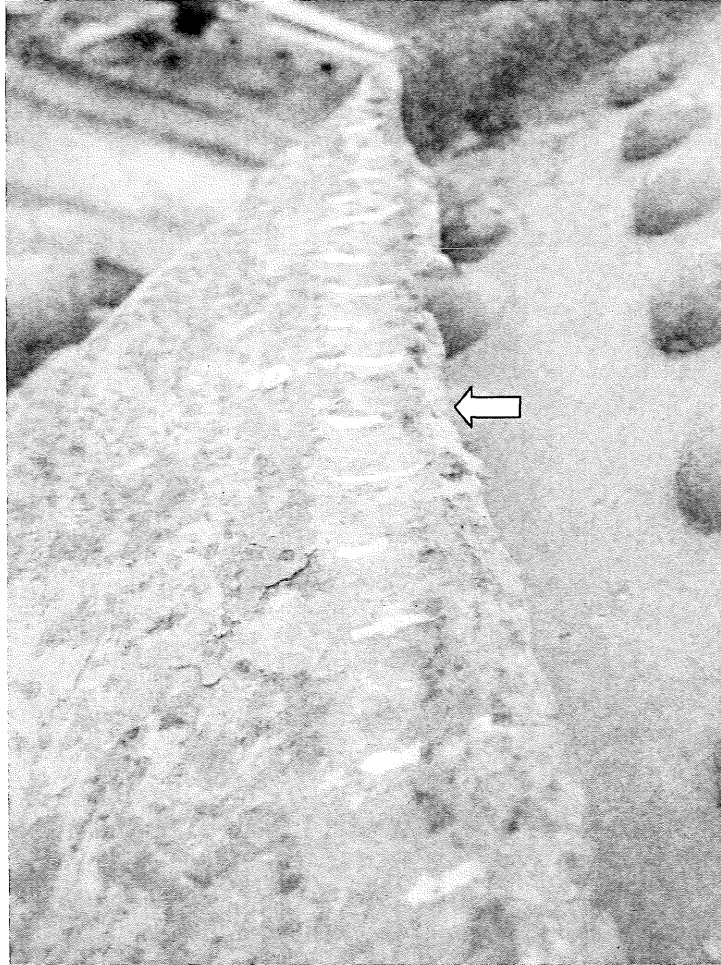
Pitting resulting from corrosion near the fracture surface of L11W. Note fractured edge adjacent to plate section loss.
